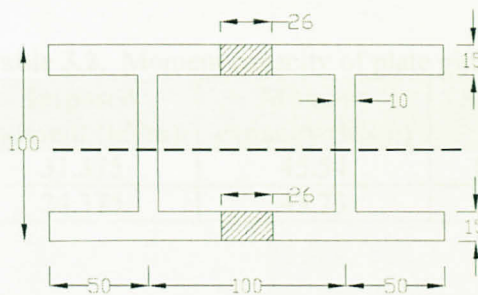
Cross section of the 975mm x 200mm x 100mm plate girder
